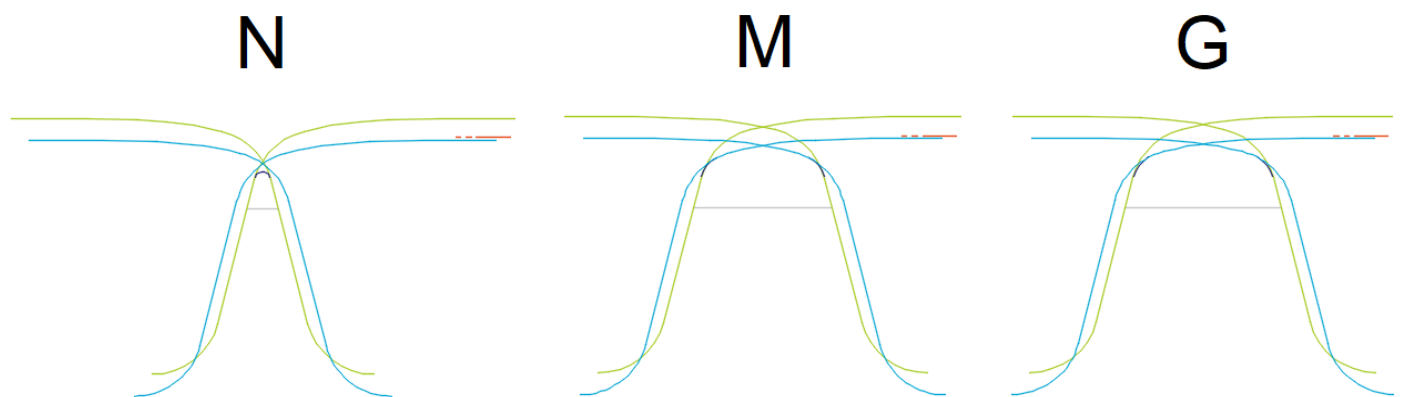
A few cross-sections of the German constructed 1:9 crossing
